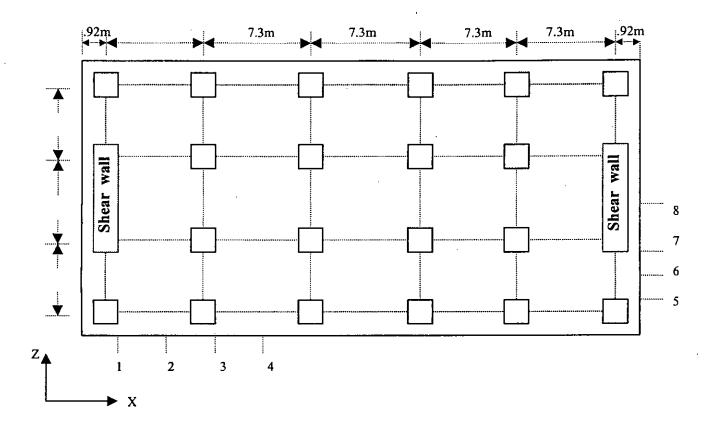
Plan area of mat with symmetrically placed Shear walls. Also showing lines along which different parameters have been studied.
